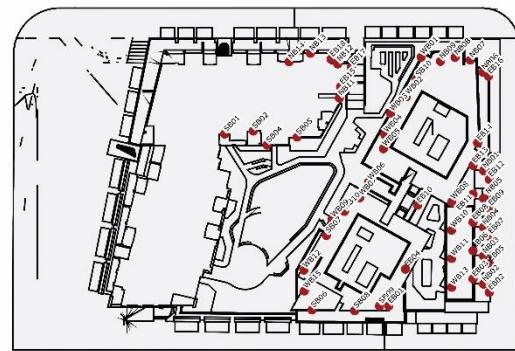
Layout of Pressure Sensors – West Elevation
